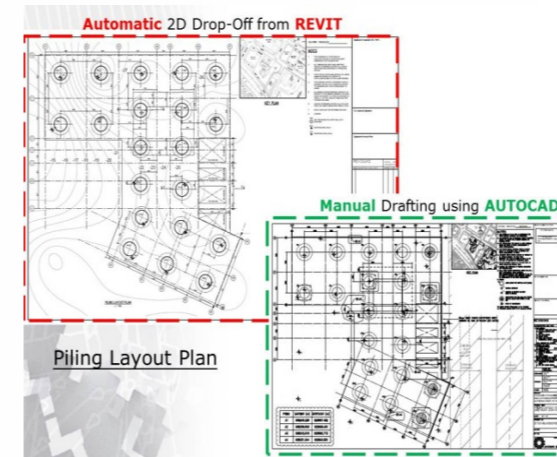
(a) – Piling Layout Plan (REVIT vs AutoCAD)
